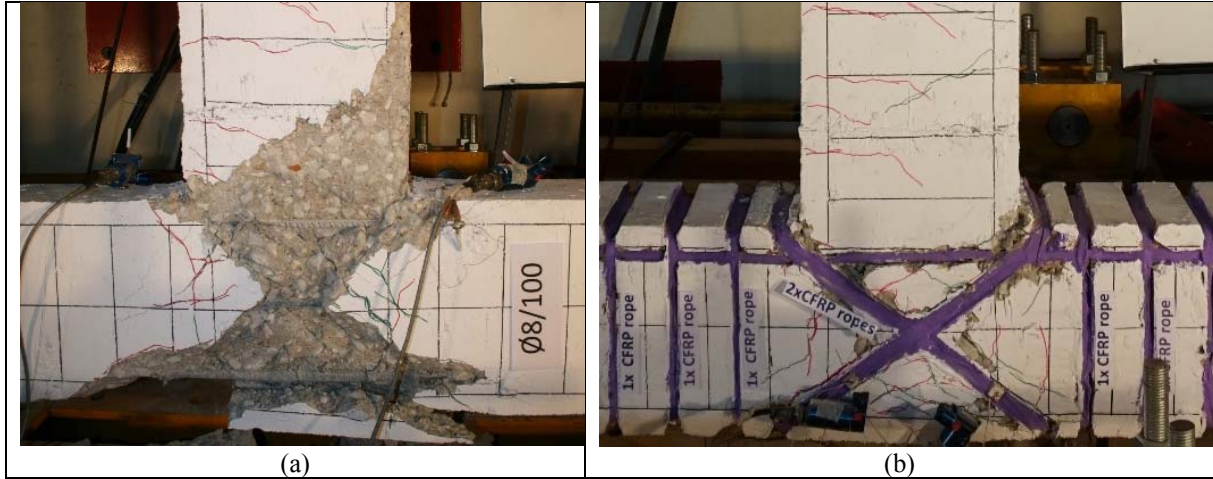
Damage state at the end of the loading (a) Cracking of specimen Sp0V and (b) Cracking of strengthened specimen Sp0VF2X2c
